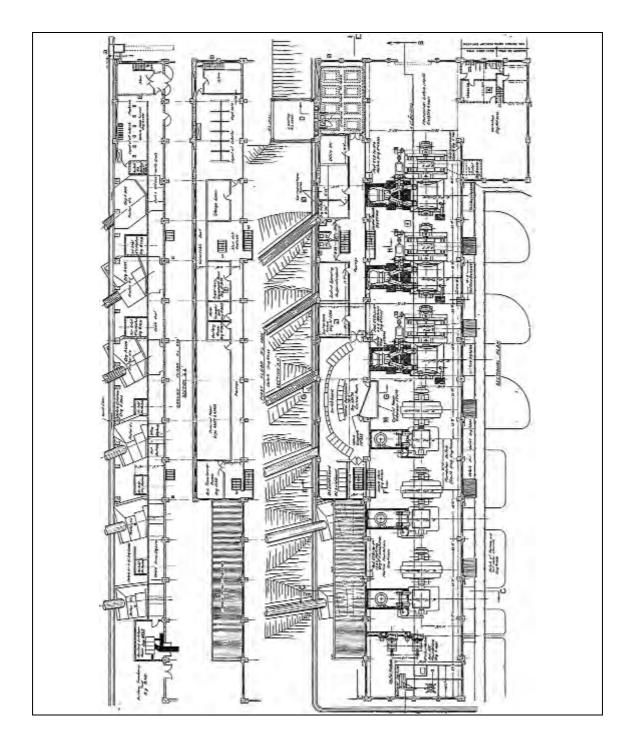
Internal layout of power station after installation of machines 4-6, showing layout of offices etc (HEC plans A5005).
